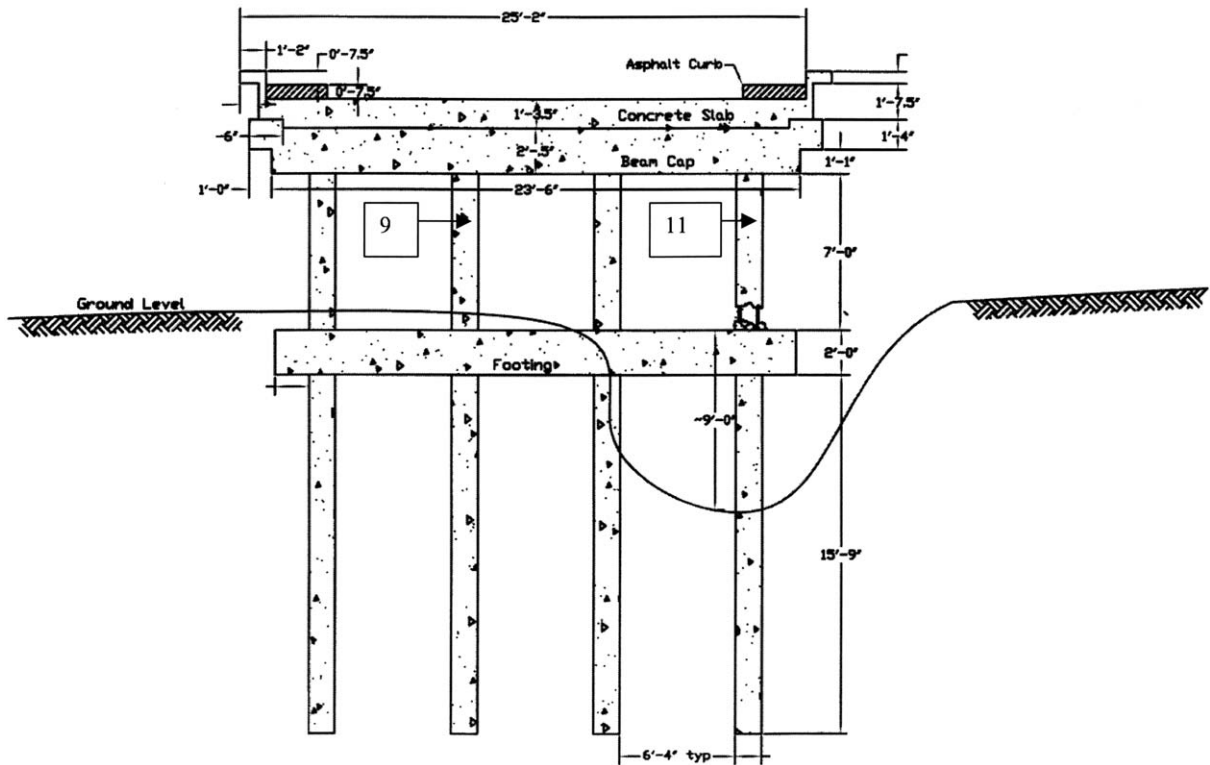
The TRR Bridge Bent-2 structure with severe-damage state, i.e., soil above and below the footing around the pile with sensor 11 was excavated, and the pile with sensor 11 was broken at its bottom just above the footing, leaving the steel reinforcing bars only. The intact state of the structure is that the pile with sensor 11 was not broken, and soil around the pile with sensor 11 is at the ground level, the same height as the soil around the pile with sensor 9. The minor-damage state of the structure is that the pile with sensor 11 was not broken, but soil around the pile with sensor 11 was excavated to the same extent as the severe-damage state of the structure.
